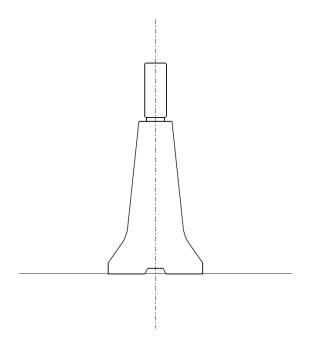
Example of 42-inch concrete barrier with glare shield
